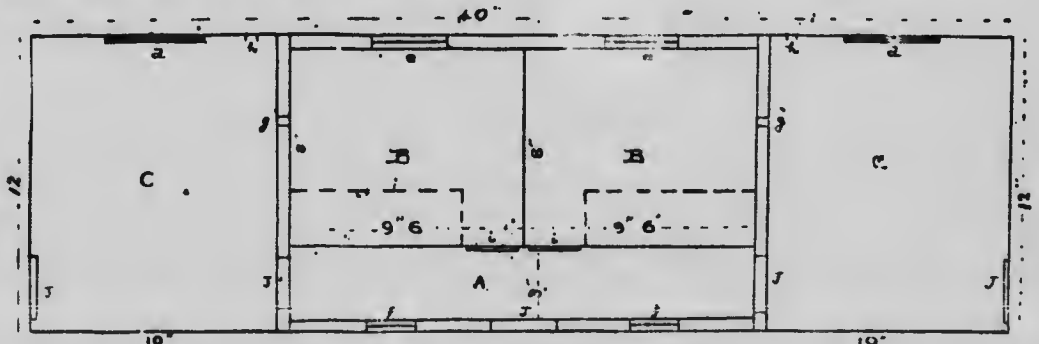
Ground Plan of Poultry House Fig. 50.
